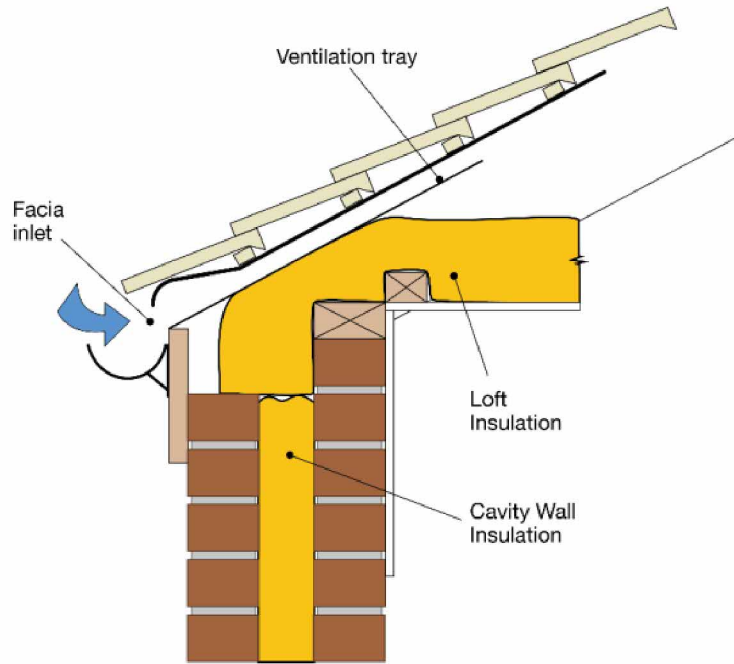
Roof eaves being extended example (Ref BRE External Wall Insulation (EWI) Report P107357-1000)
